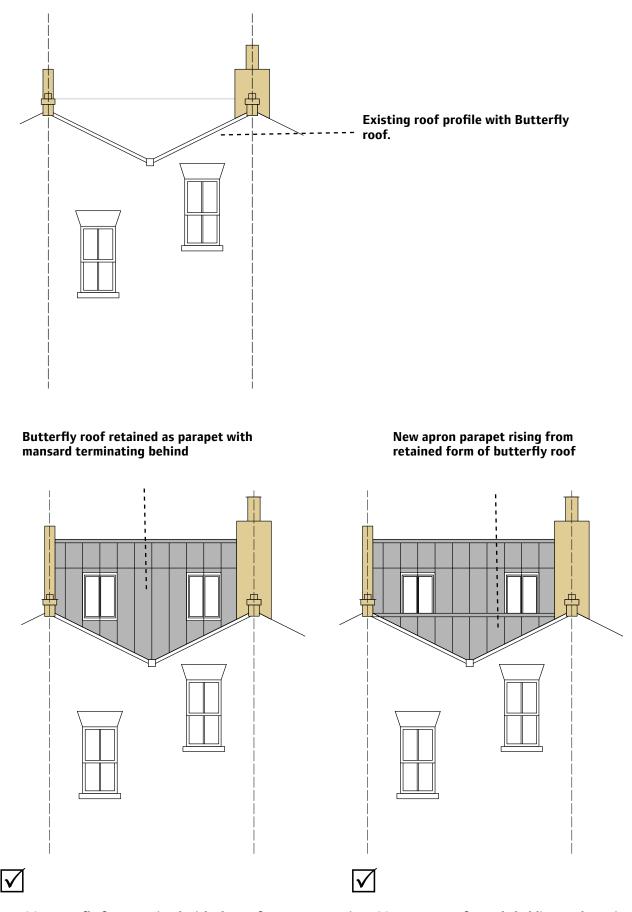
Butterfly form retained with slope of mansard running down to meet the existing eaves
